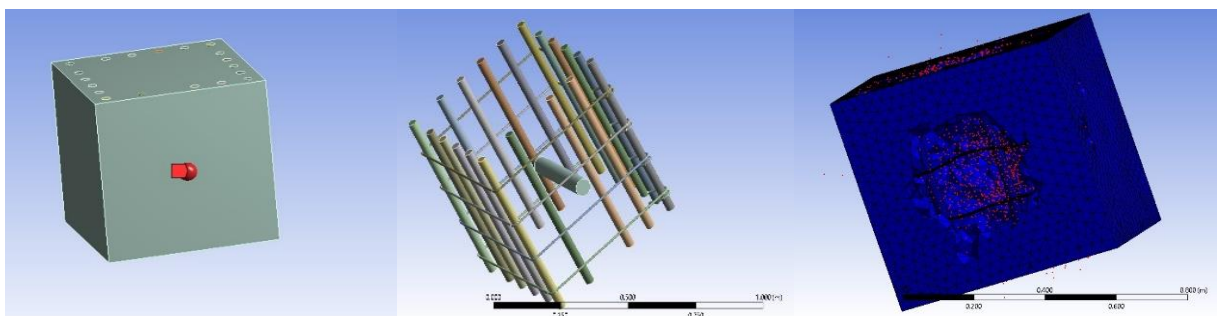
Model of Section of Reinforced Column with demolition charges used for simulation
